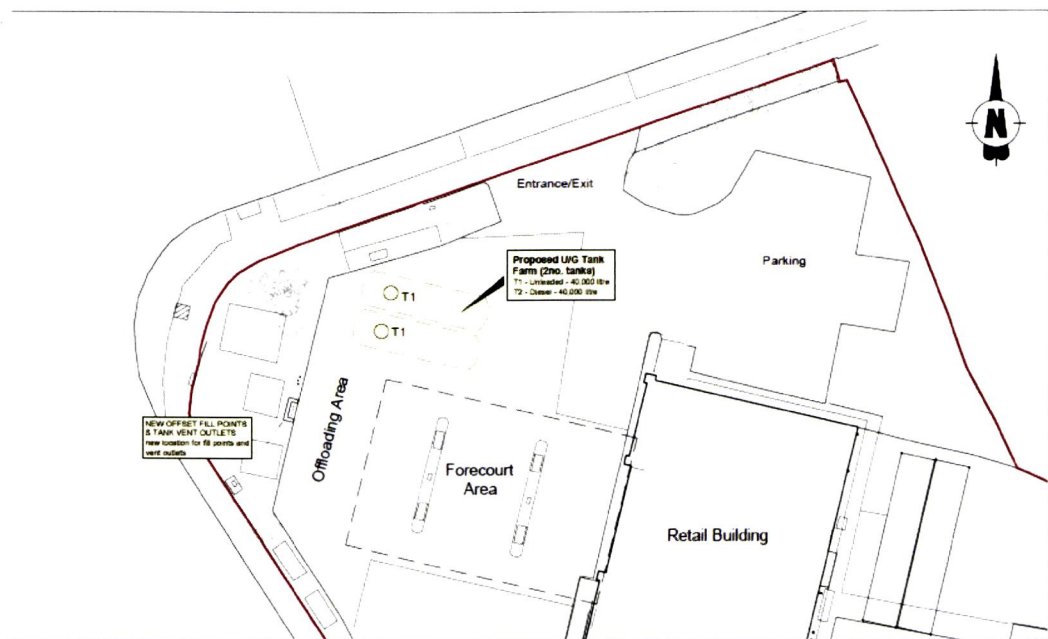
Extract from site layout plan prepared by JA Gorman Consulting Engineers showing location of proposed tank.
